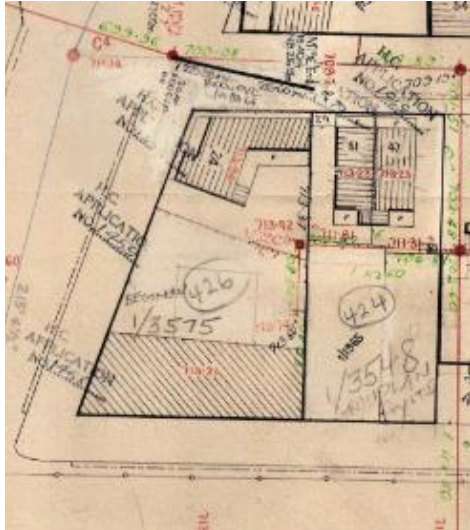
The former Federal Coach Factory as it appears in the sewerage plan from 1923. The original factory building had an irregular-shaped footprint. (Source: Bendigo Sewerage Authority Detail Plan No. 37, 1923)
